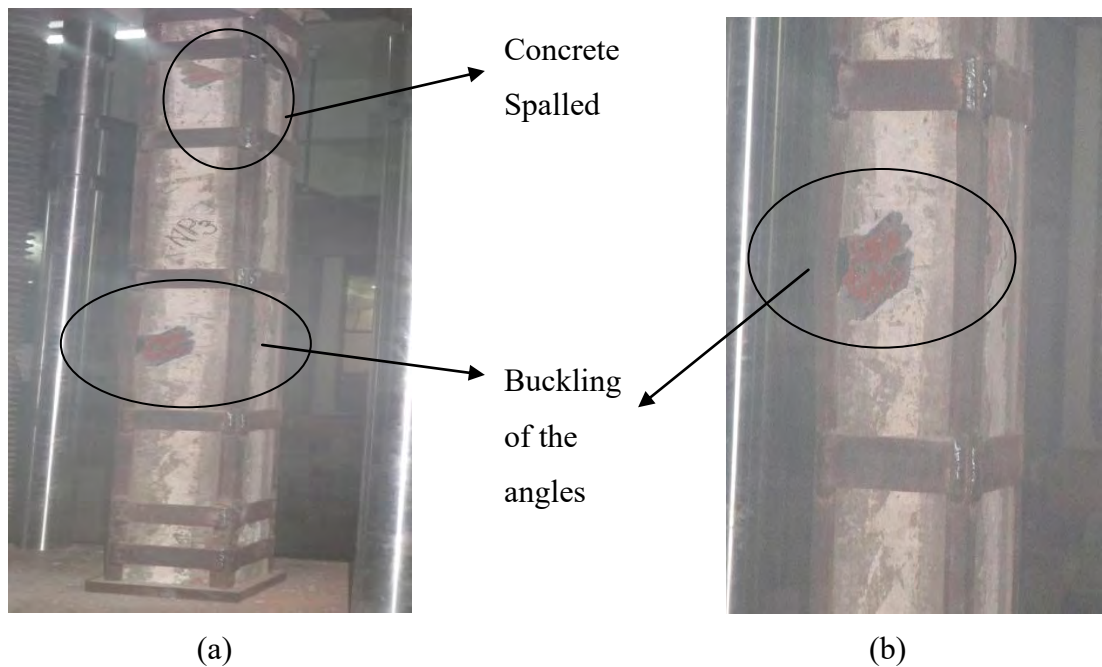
Failure mode of the strengthened column NP2.1, (a) Failure shape; and (b) Buckling of the angles and appearance of concrete cracks.
